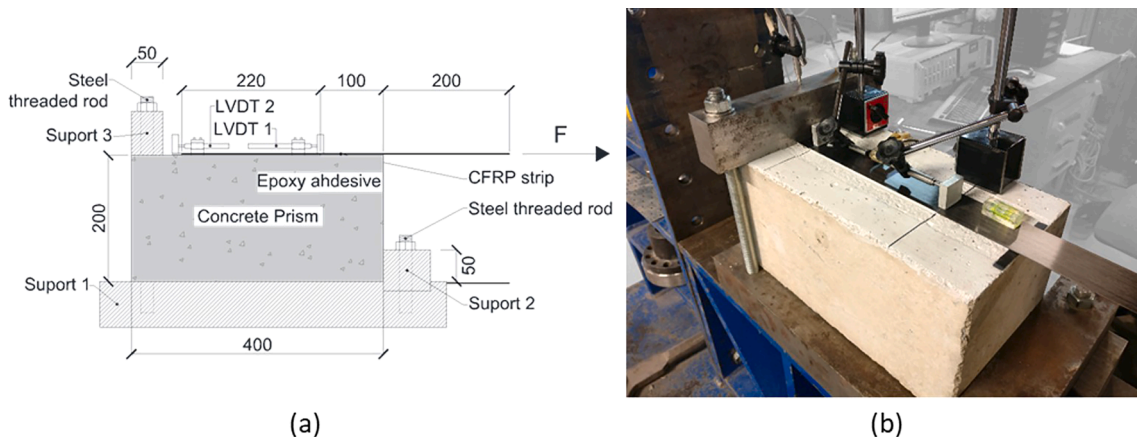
Pull-out shear test of bond EBR-CFRP to concrete: (a) specimen's geometry and test configuration and (b) photograph of the test. Note: All units in [mm].
